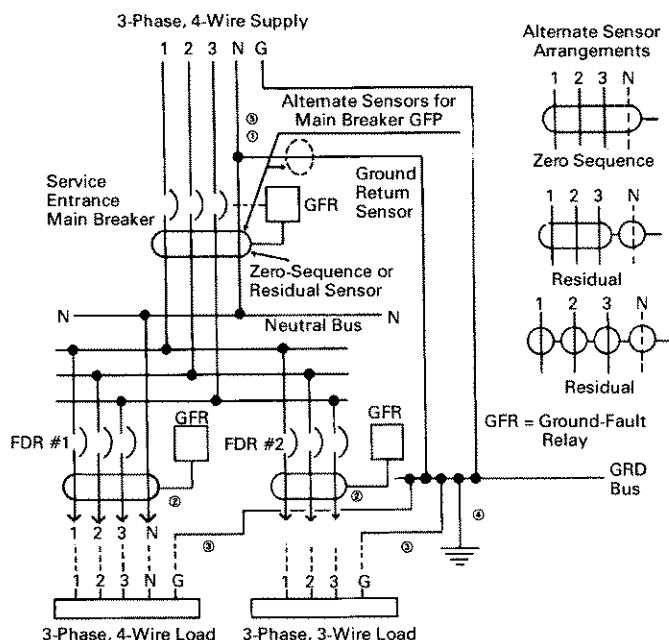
Typical single-source ground-fault protection using ground-fault relays.
